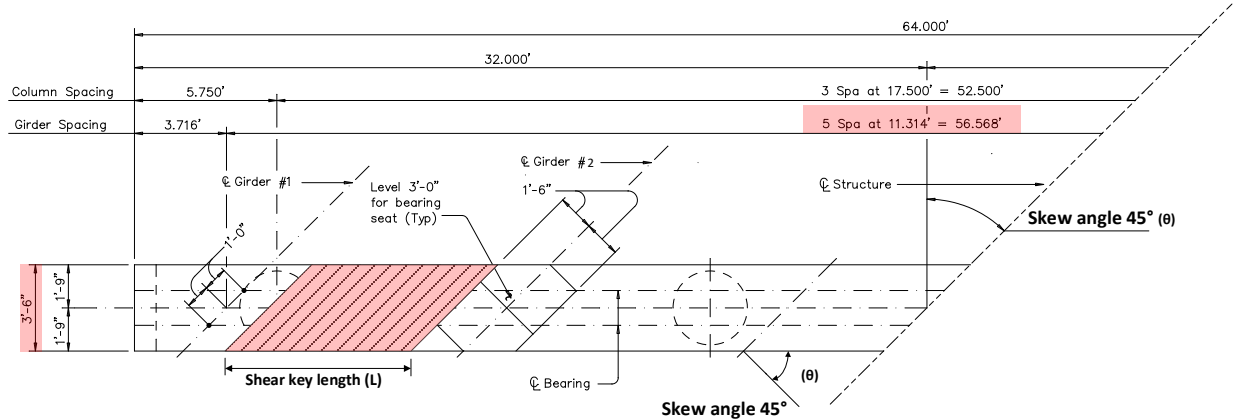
Bent cap for 44-ft roadway 45-degree skew I-girder bridge
